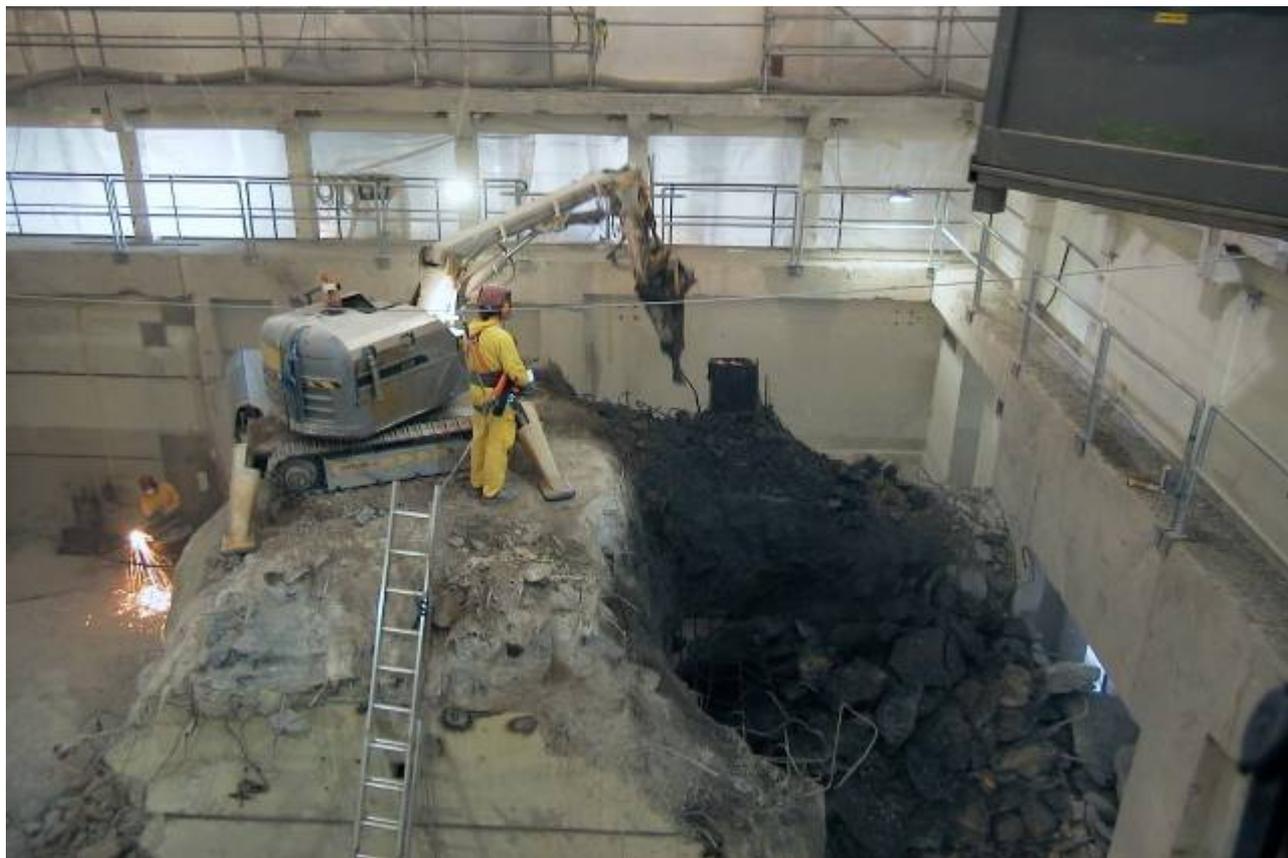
Demolition of intermediate ceilings and walls – expanded decontamination
